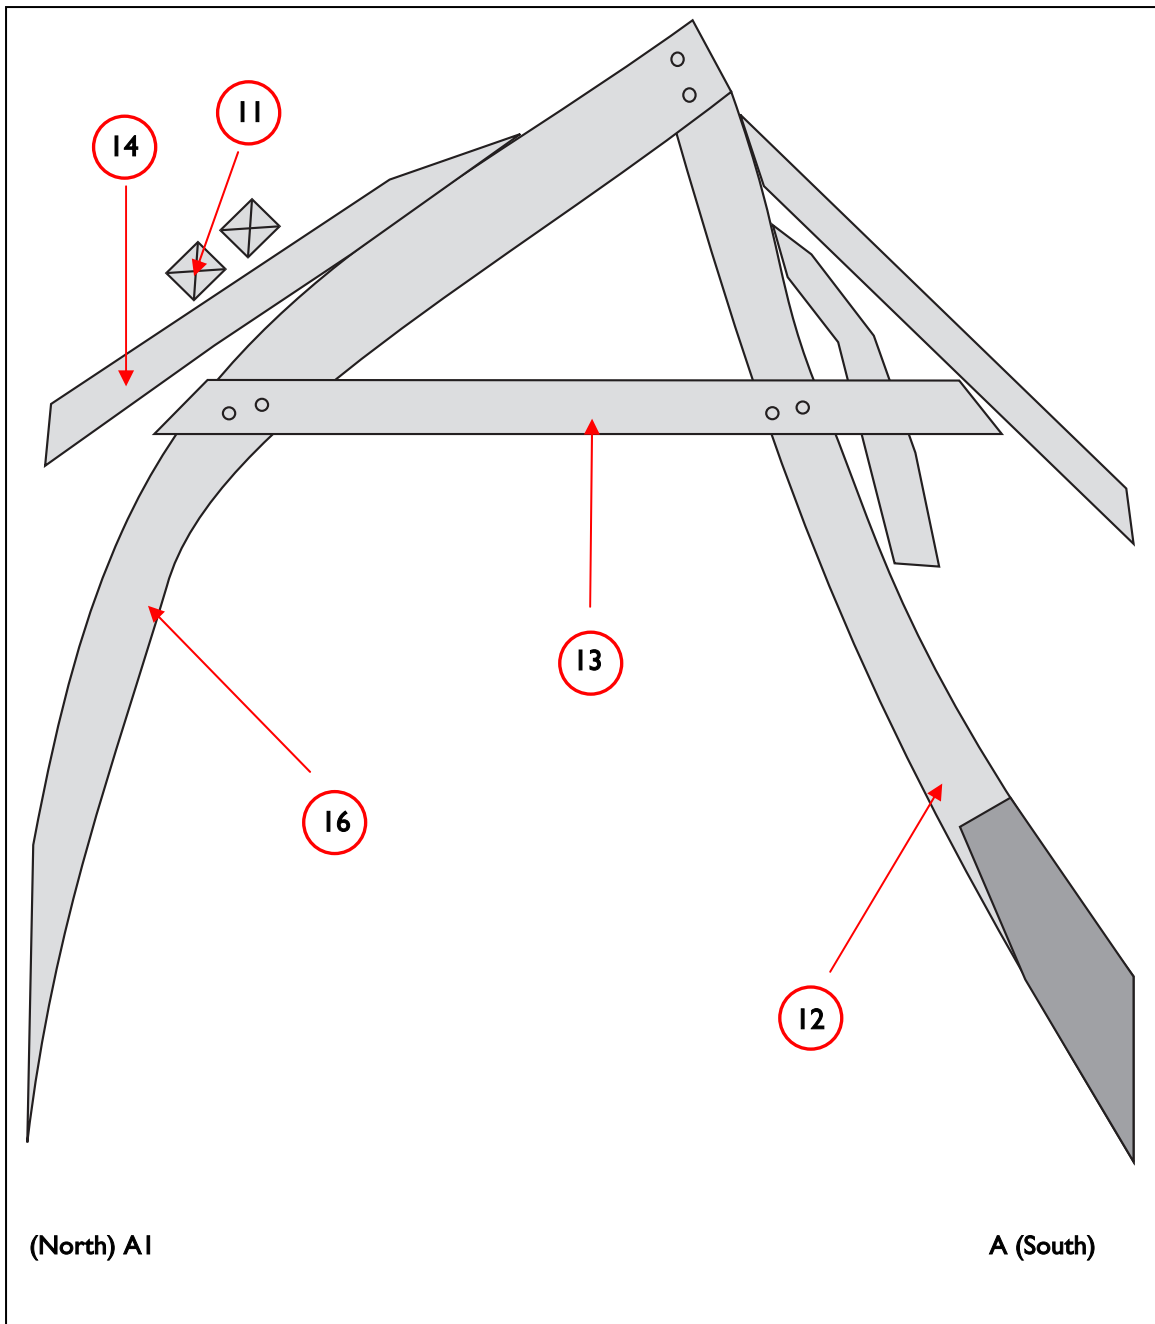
Barn 2 – schematic section of truss A-AI to show sampled timbers. The shaded area indicates a redundant half-lap joint (viewed from the west looking east)
